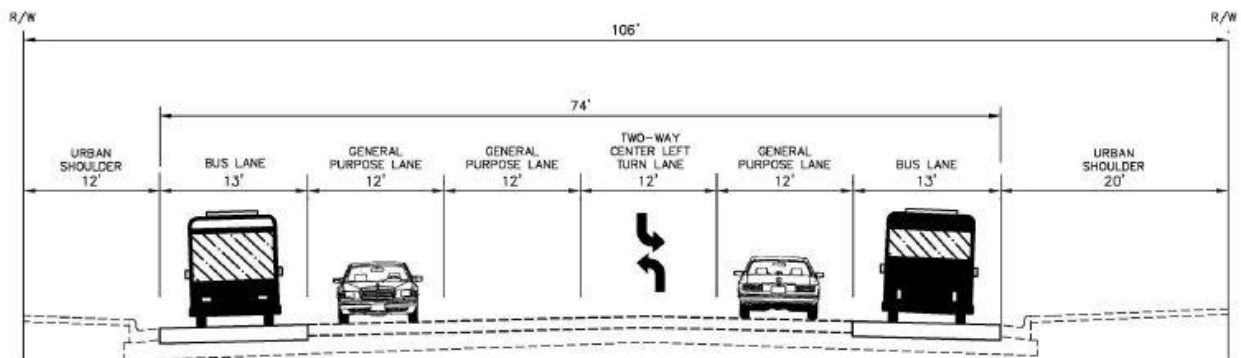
Proposed Typical Section on Akers Mill Road -- Side-Running Dedicated Guideway
